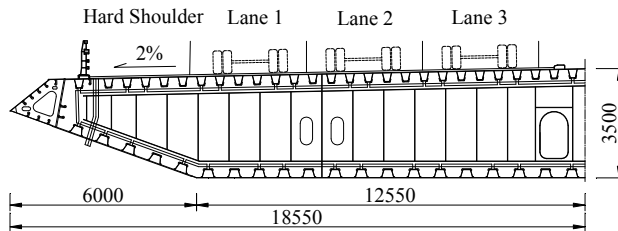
Cross Section of Steel Box Girder (Unit: mm)
